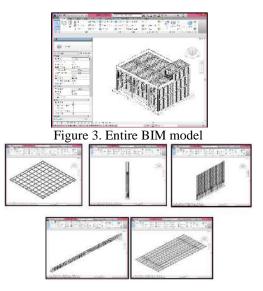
BIM model components (Foundation, Column, Wall, Beam, Slab)
